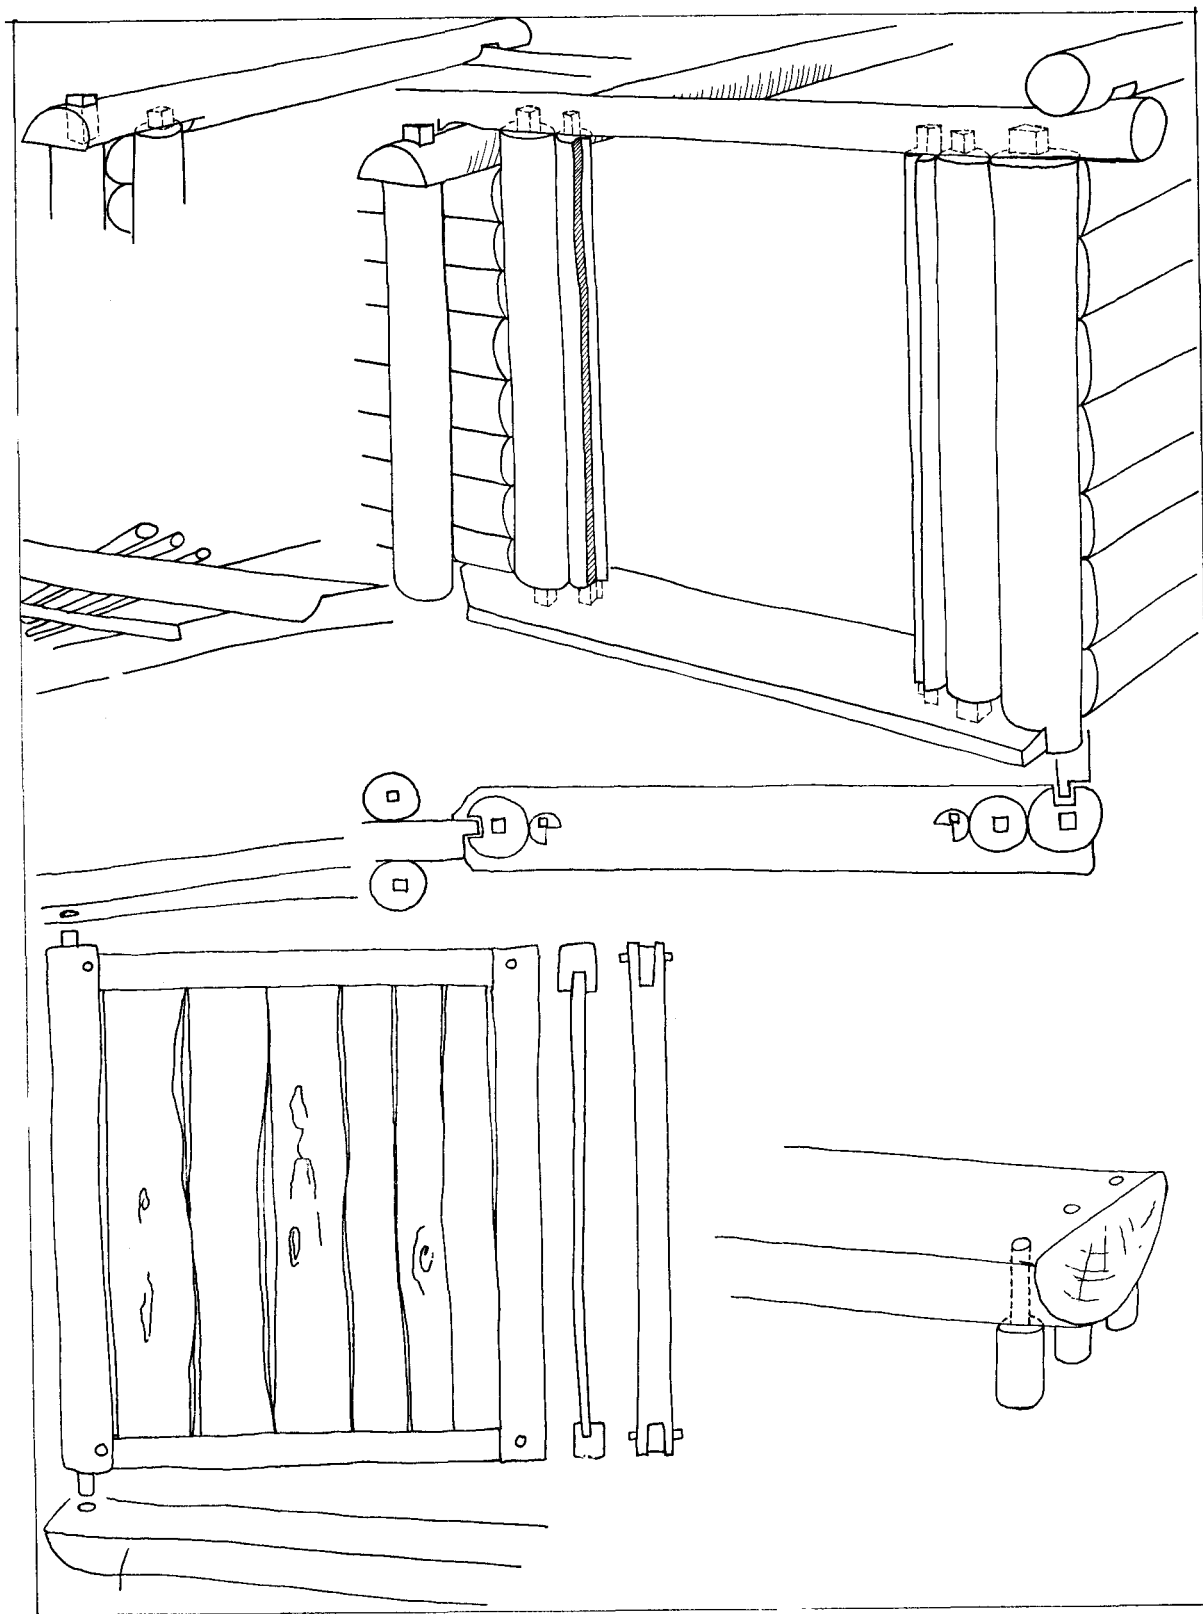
House No. 69. Construction of the entrance area. Above left — a transversal trunk and „polenice“ (log-drying space); above right — entrance with a door-frame with halfgrooves and ground plan of the threshold; below left — a door of planks inserted into the frame grooves: below right — the inner step. Drawn by R. Pleiner — H. Houfová.
